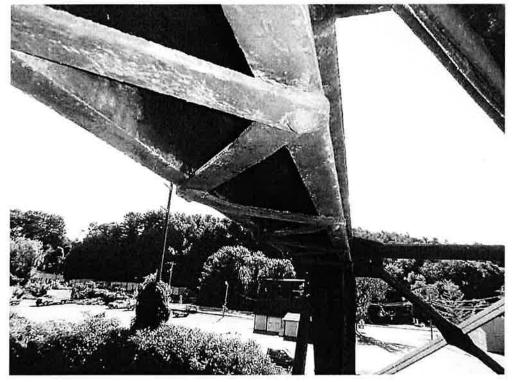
North tower, outer truss, member U14-U16, looking east - bent lattice member.
